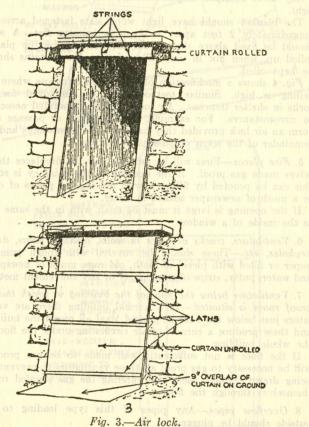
shows one method of construction, by setting up two blanket curtains across the entrance passage. The curtains should be at least 4 feet apart; 10 feet should be aimed at to give greater protection and to allow for a stretcher case with bearers to enter. The best arrangement is for the blankets to rest on inclined frames to ensure a close fit.
